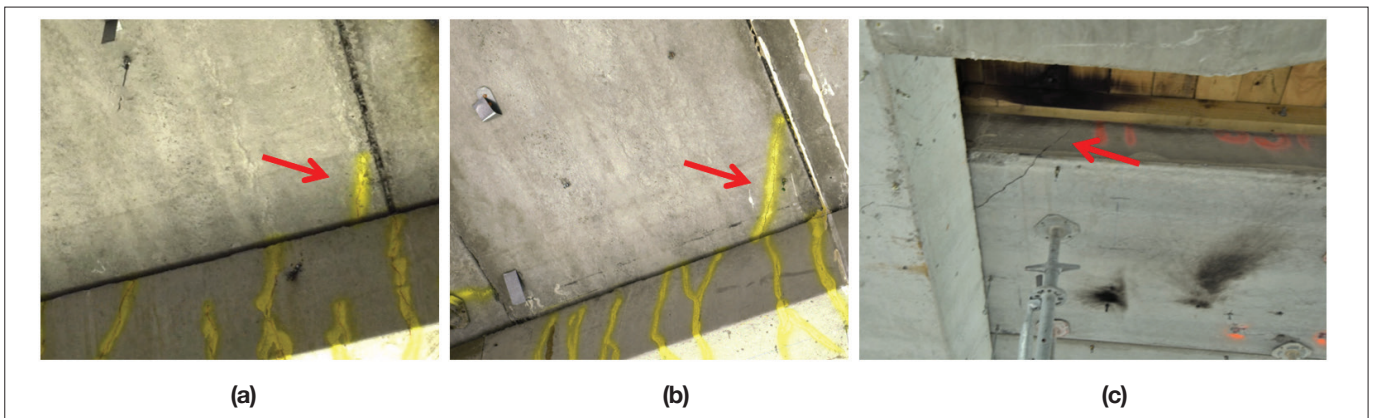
(a) minor hairline corner crack (b) Moderate corner crack (c) corner cracking propagating through exterior web when visible
